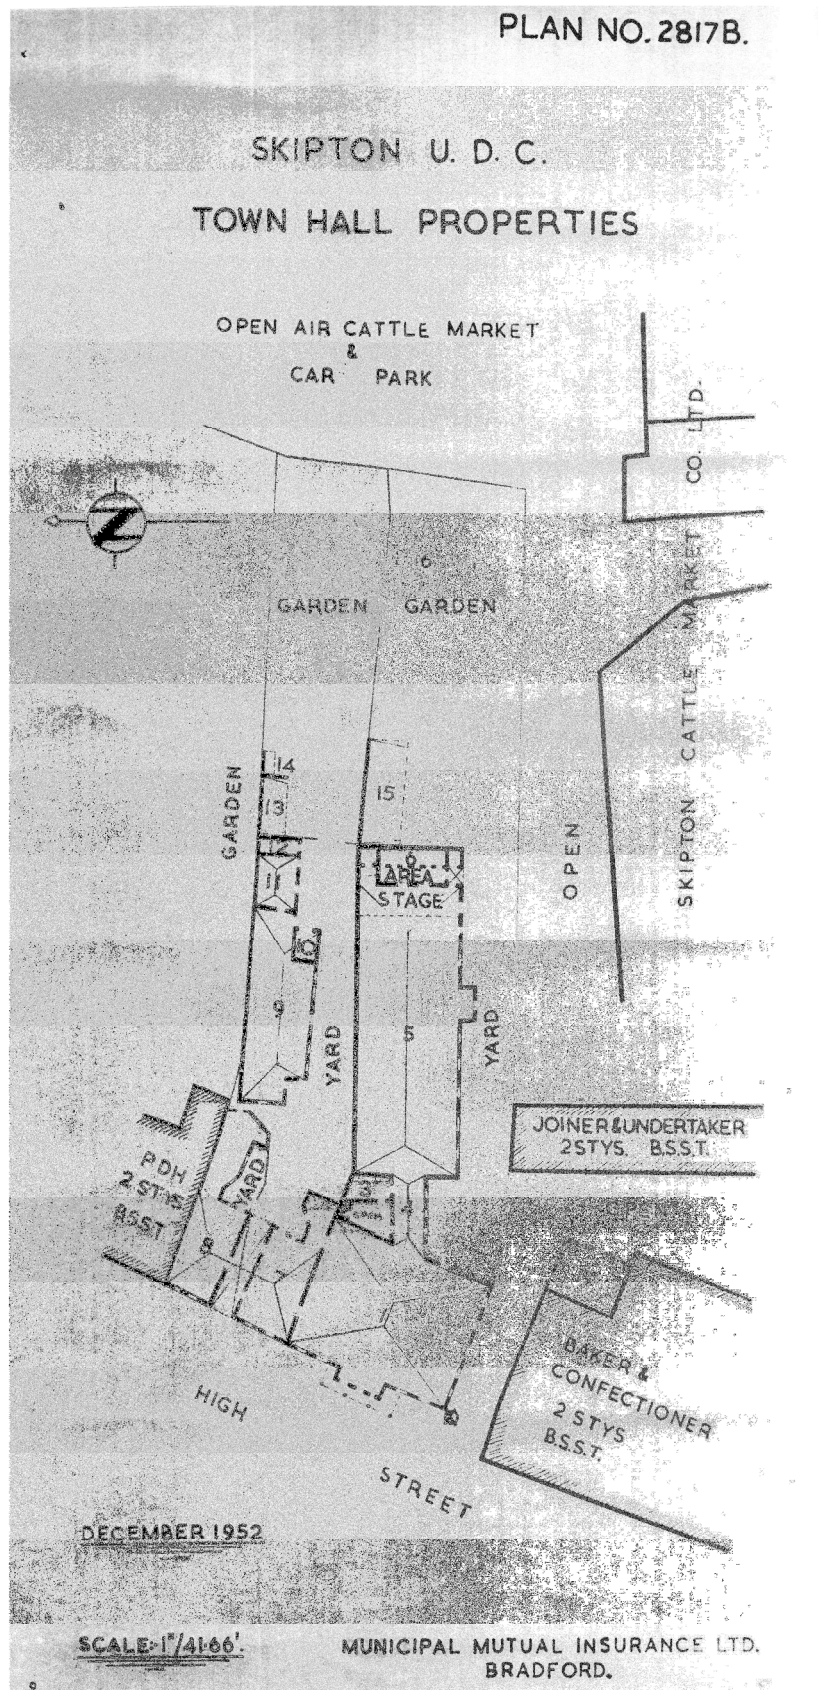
Insurance plan of the site, 1952. Found in a box in strong-room G16; the roofs are incorrectly shown hipped. The barn in Red Lion Yard, used by a joiner and undertaker, is extended to the Town Hall yard boundary.
